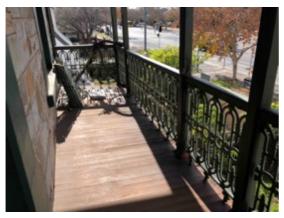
Dilapidation Inspection: Balcony Source: Flightpath Architects, July 2018.
